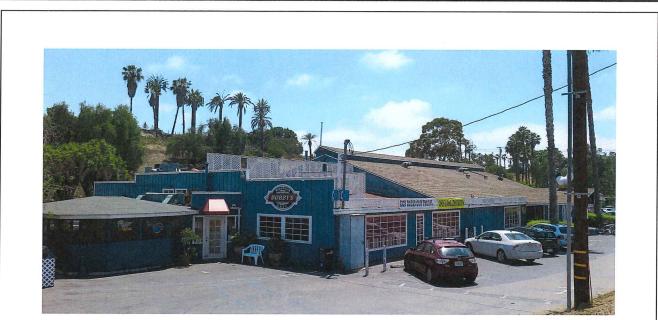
View of the northeast façade of the east wing of Building #2 showing the 1965 warehouse and 1984 dining area additions, facing southwest.
